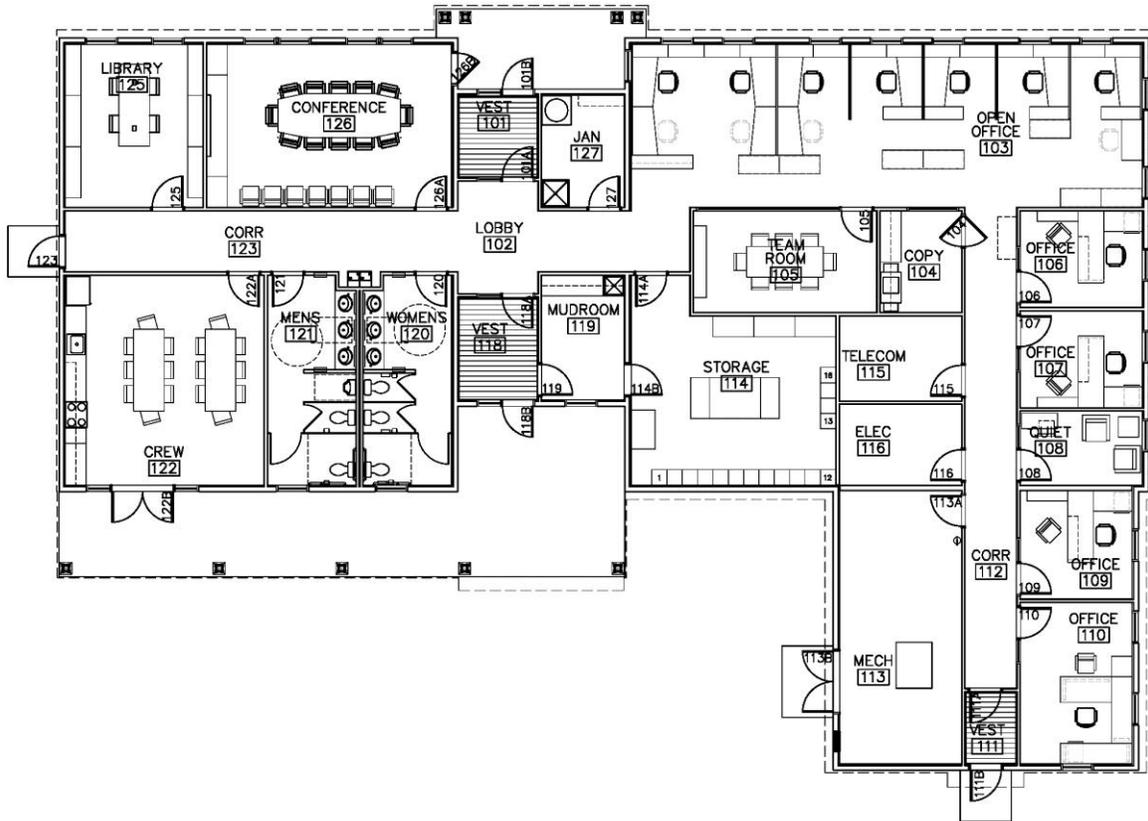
Floor Plan for the Proposed Administration Building – Phase 2
